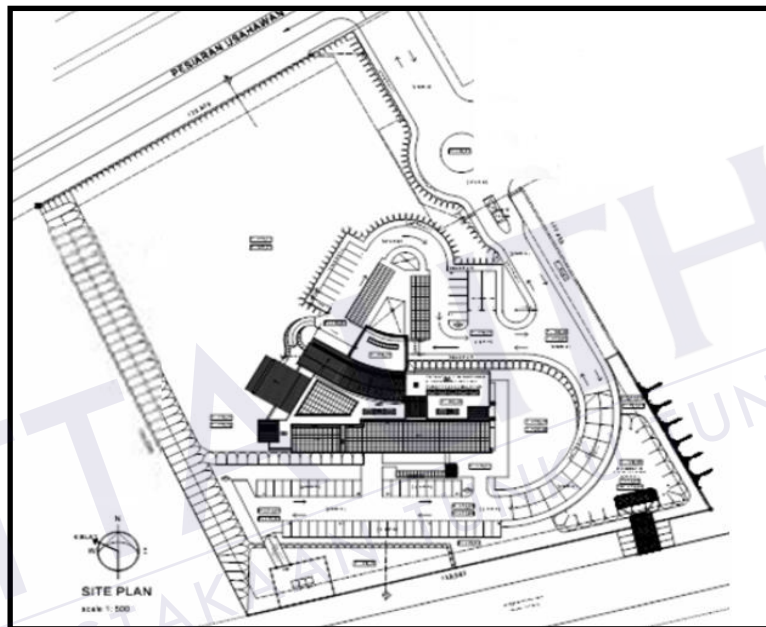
Site plan of Malaysia Green Technology Corporation building
